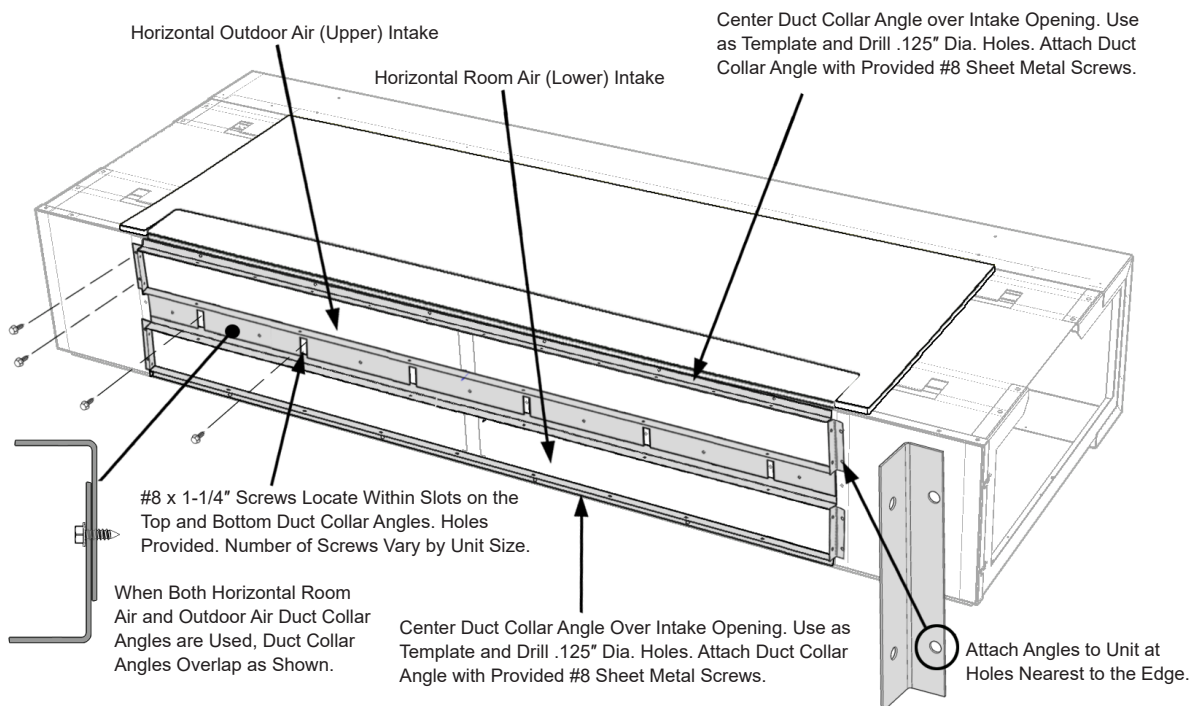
Horizontal Room Air (Lower) Intake Duct Collar Details
